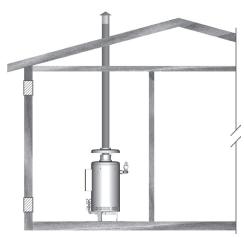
OUTDOOR AIR THROUGH TWO OPENINGS
